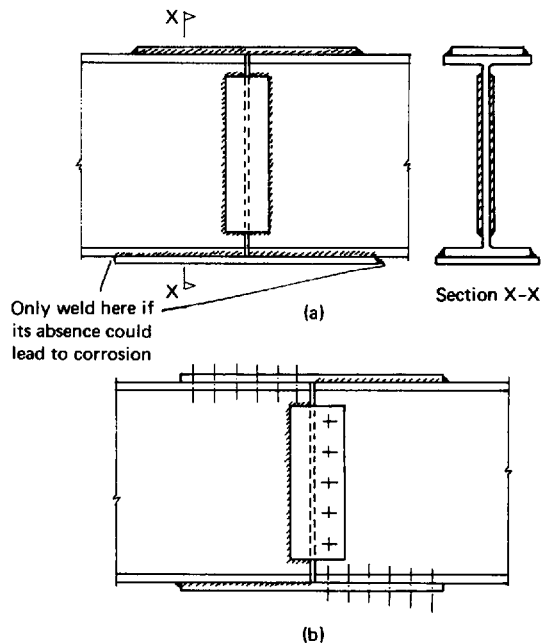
Light beam splices. (a) All welded; (b) bolted and welded
